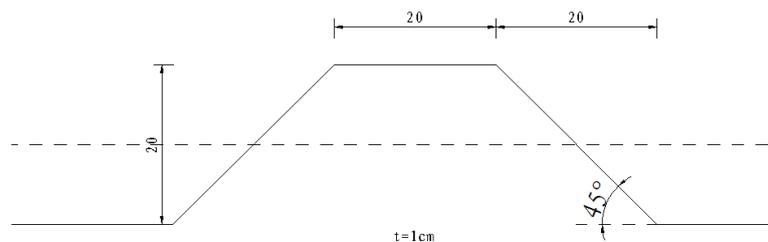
Diagram of corrugated steel web dimension (Unit: cm)
